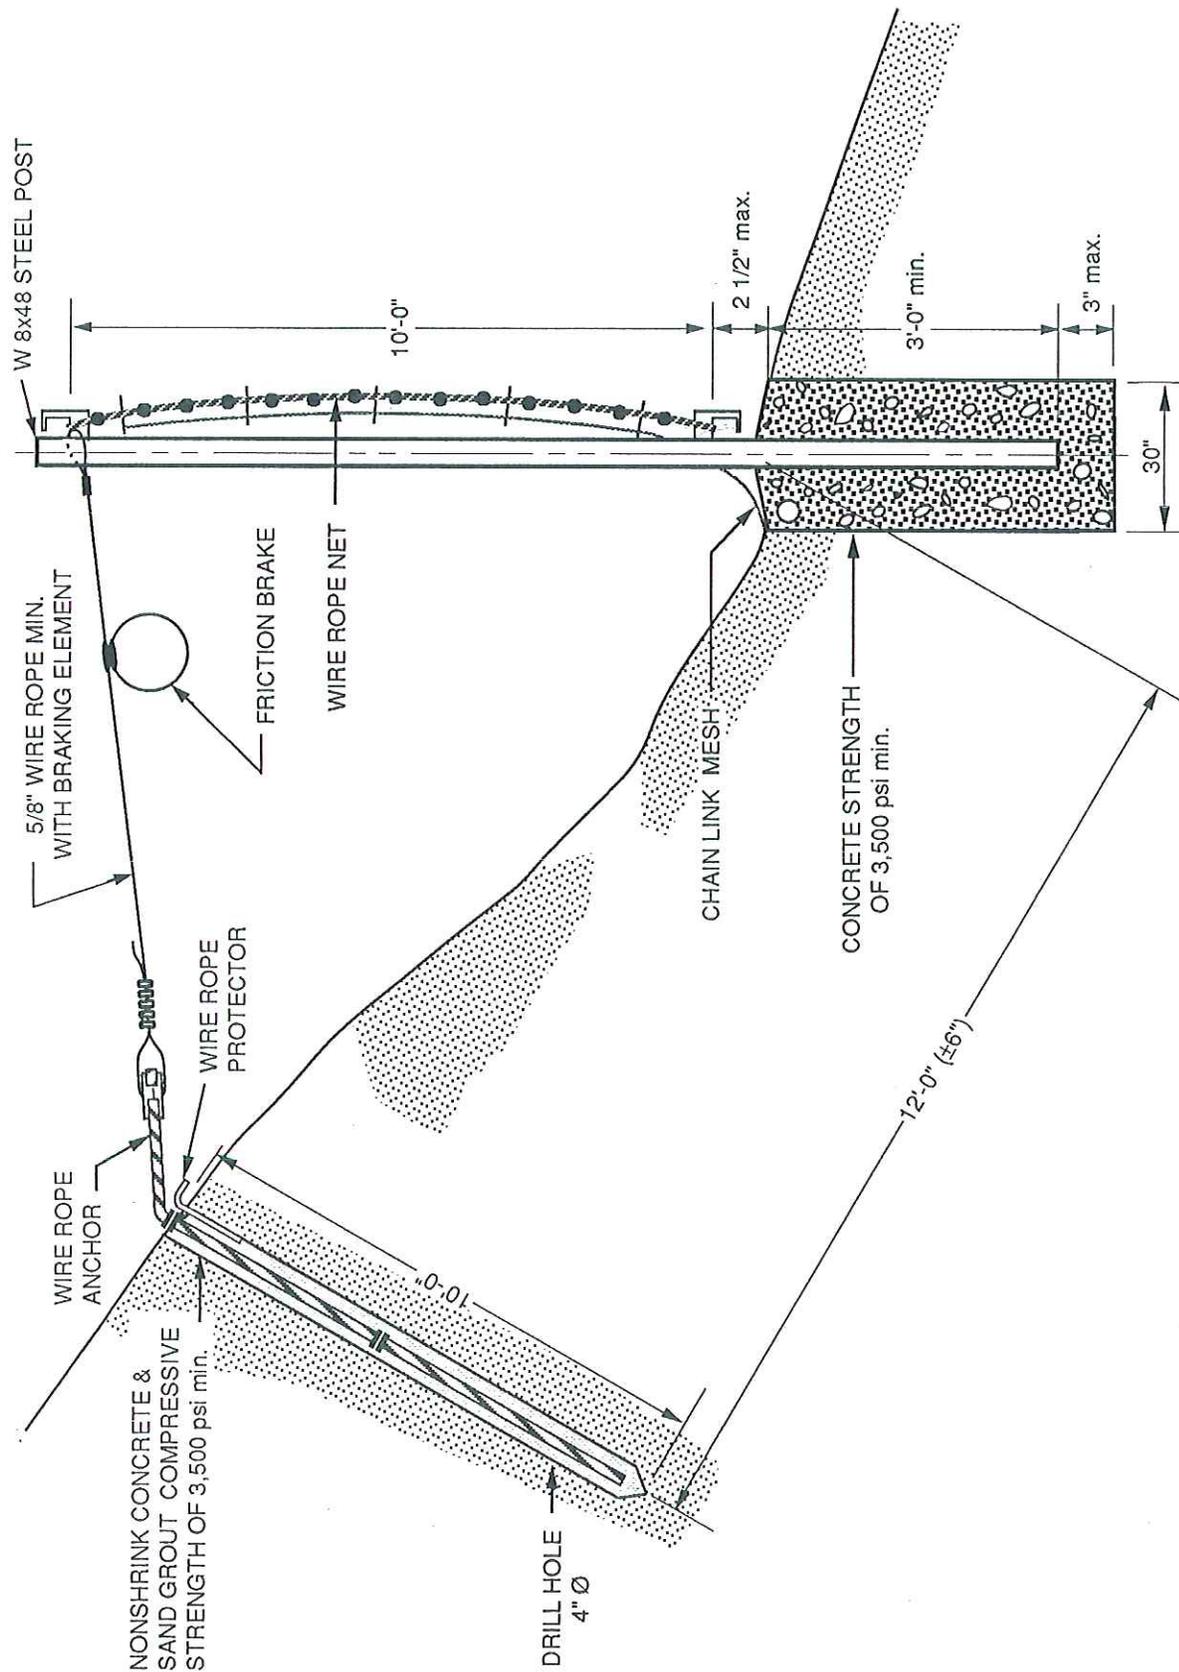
SIDE VIEW OF A BRUGG FULLY EMBEDDED POST FOUNDATION WITH UPSLOPE ANCHOR SUPPORT
